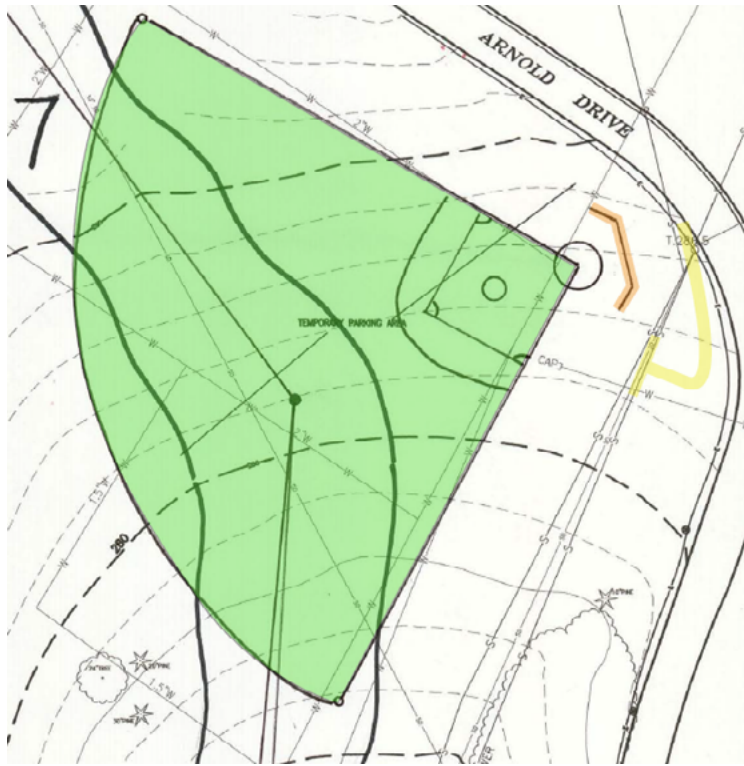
Known aboveground and belowground remnants of historic pathways will be protected by temporary construction fencing, as shown on this plan.
